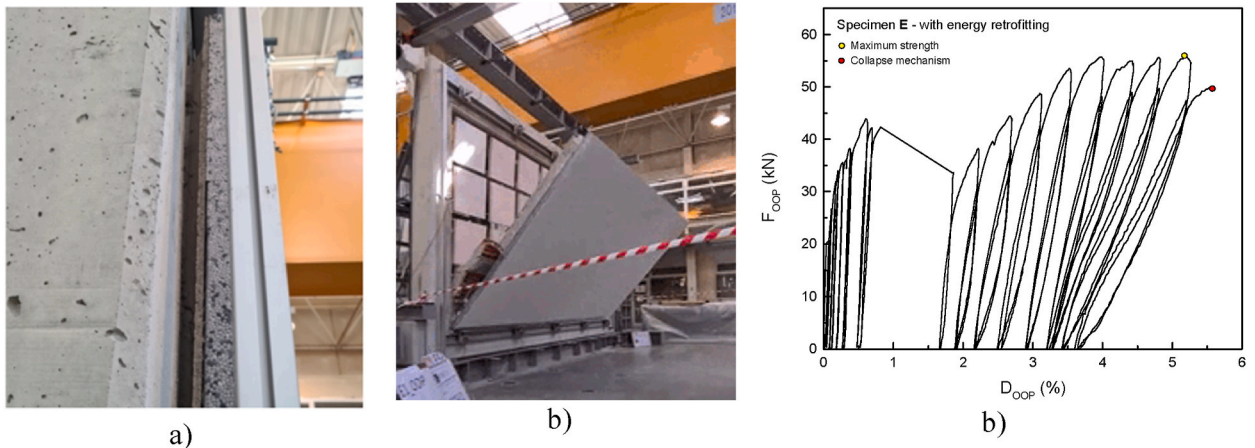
Specimen E: a) Panel detachment in the top interface; b) Collapse mechanism; and b) Force-displacement curve.
